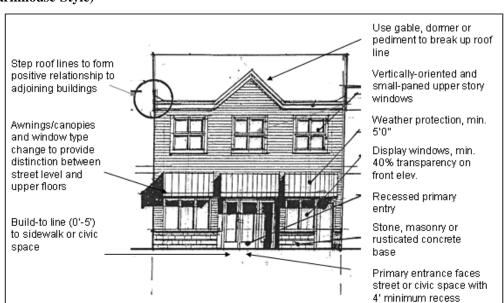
B: Typical Building Elements in Historic Roadside Commercial (Farmhouse-Style)
